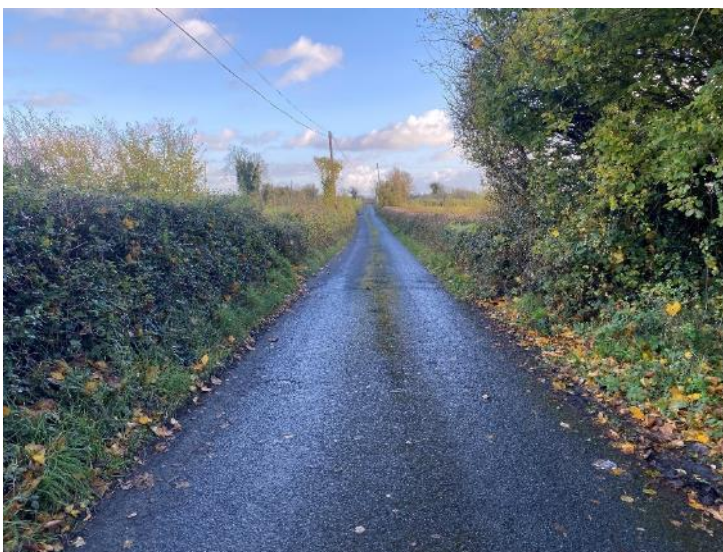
Bridge CH1 on proposed Grid Connection underground cabling route, looking SE.
